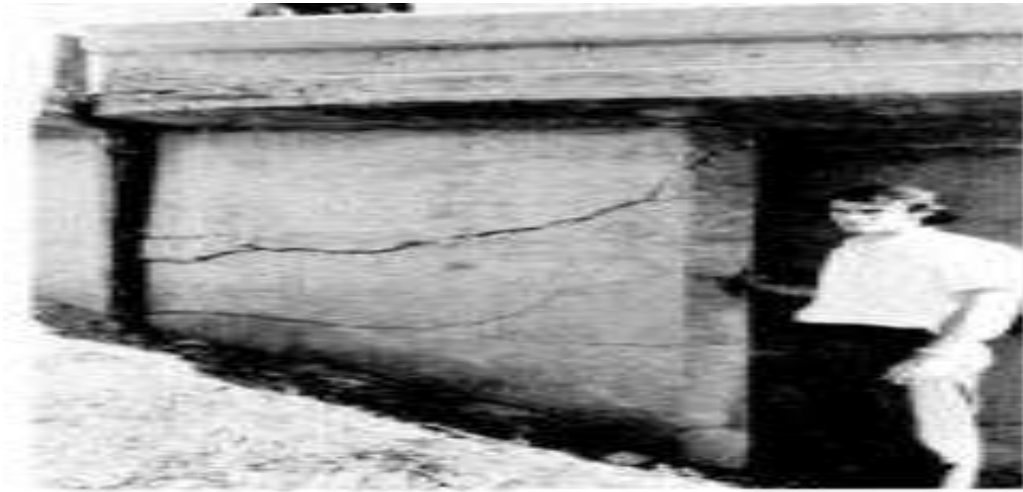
Abutment of Northwestern bridge of FBU [10]
